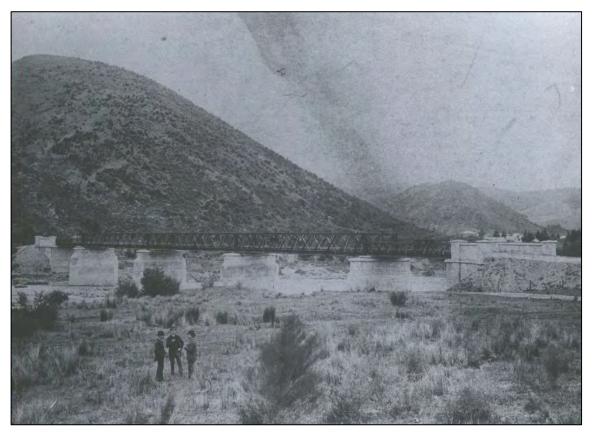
Photograph showing the opening of the Beaumont Bridge in 1887 (source: Hocken Collections Asset ID 6263). The bridge approaches are clear here
